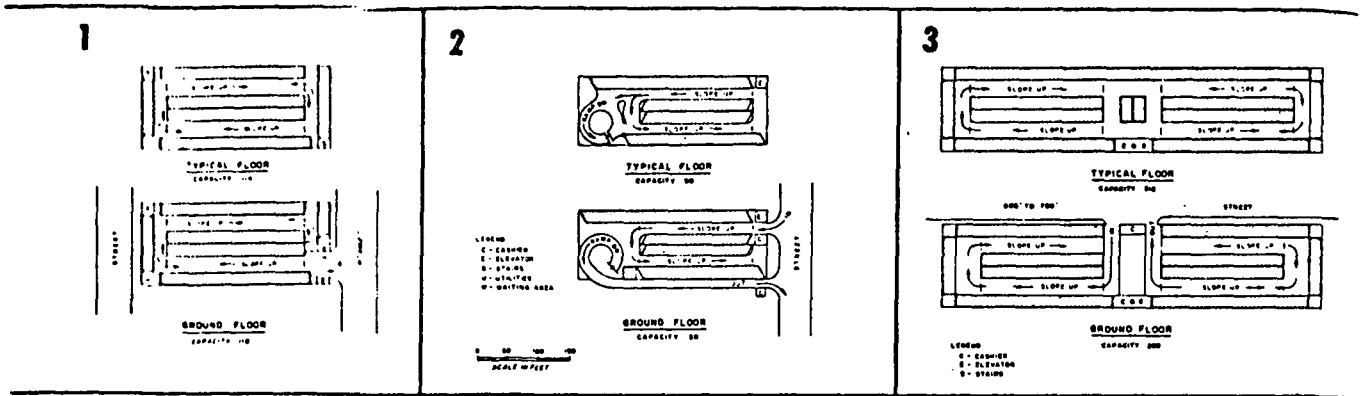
TYPICAL SLOPING FLOOR GARAGE DESIGNS
